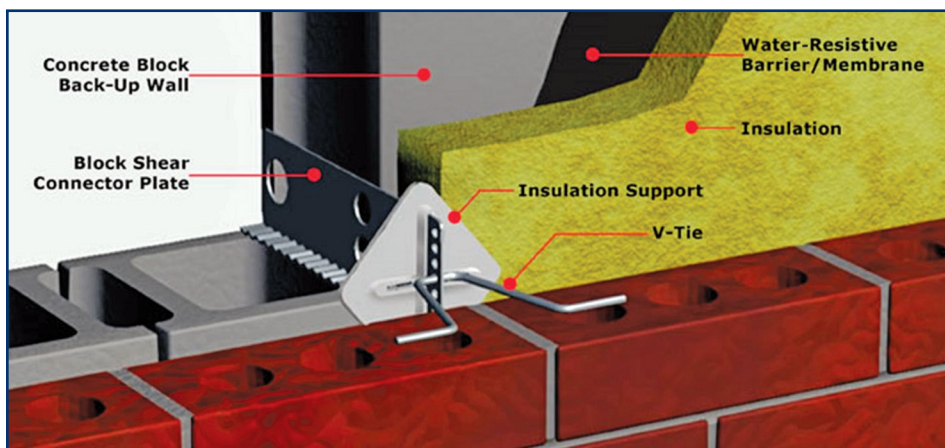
Slotted block tie for concrete-block brick veneer.⁷
